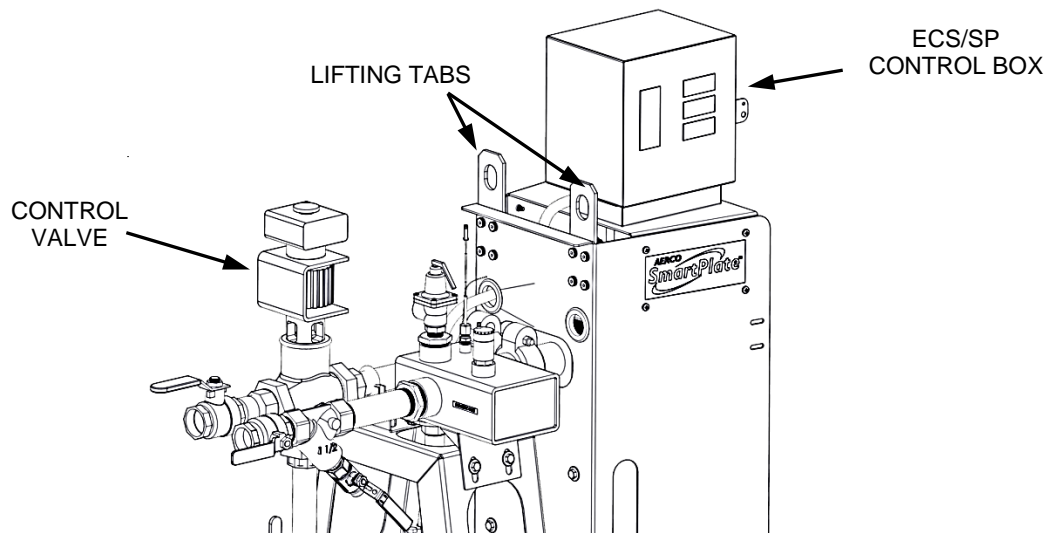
a. SmartPlate Lifting Provisions – Single-Wall Models
